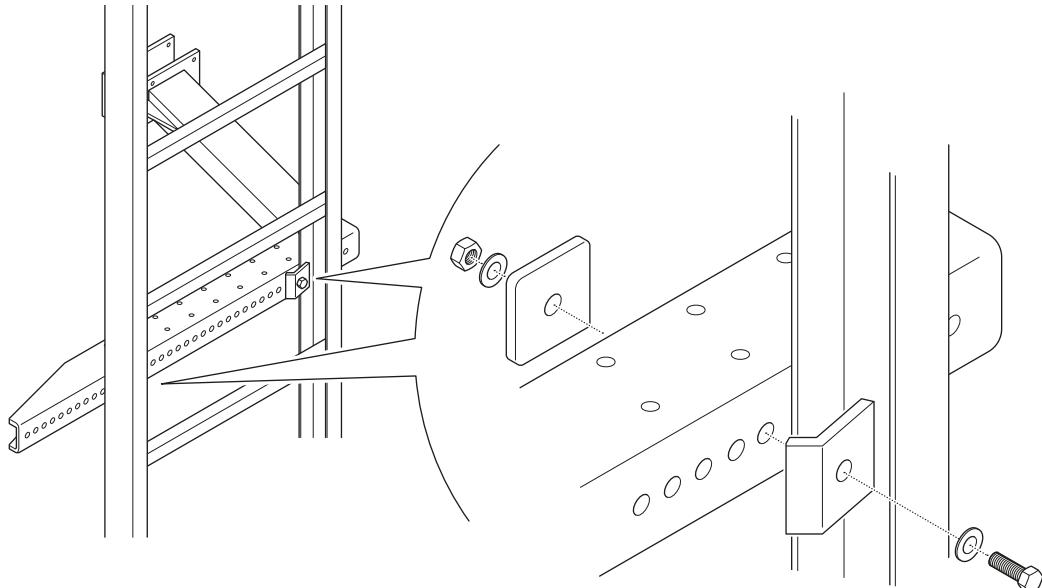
Attach the platform mounting beam to the Glass Elevator with fixation plates
